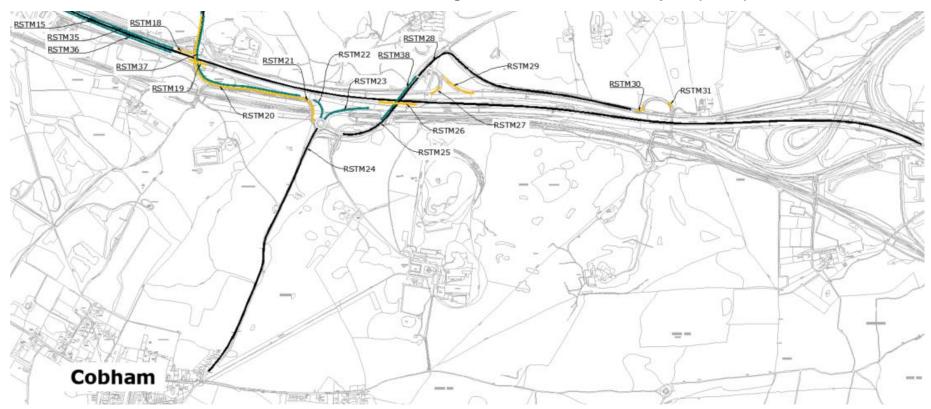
Roads South traffic management measures location plan (2 of 2)
